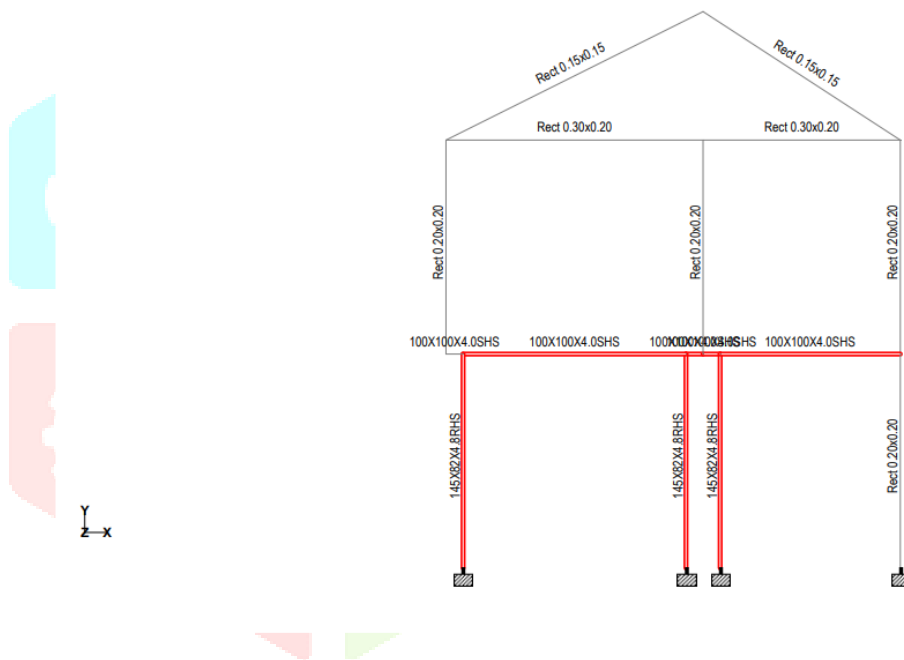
Steel strengthening bathroom joint stress ratio at mahudha timber lime structure
